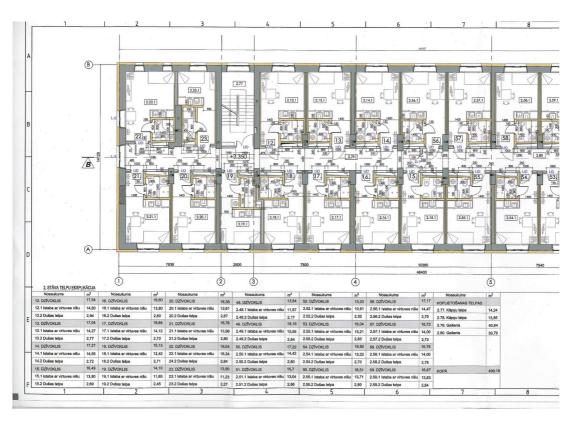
Floor plan of the municipality property reconstruction of social housing at leriku Street 28 (Riga: Liga Treija, n.d.)
